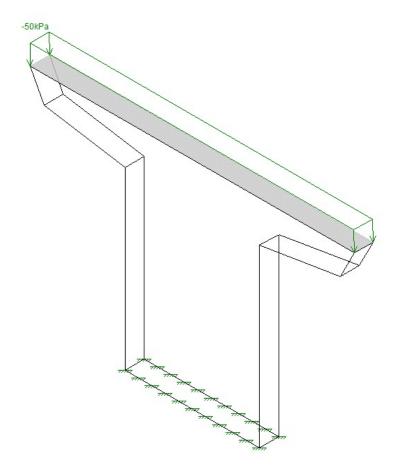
Sample Bridge Pier Drawing [1]
